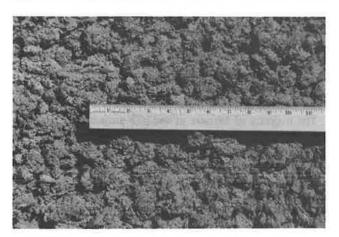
Fuzzy finish surface on nonhighway side of concrete barrier.
